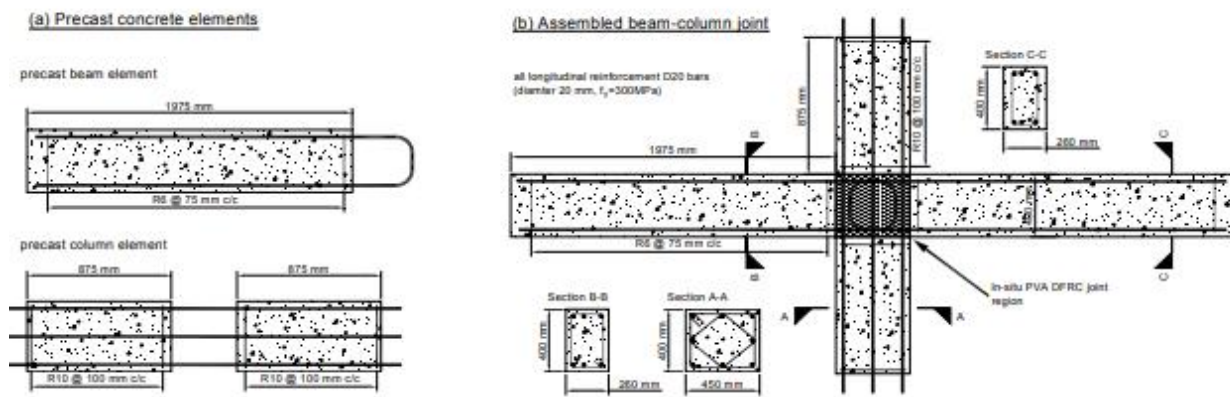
Precast beam-column joint design used for PVA-1 and PVA-2
